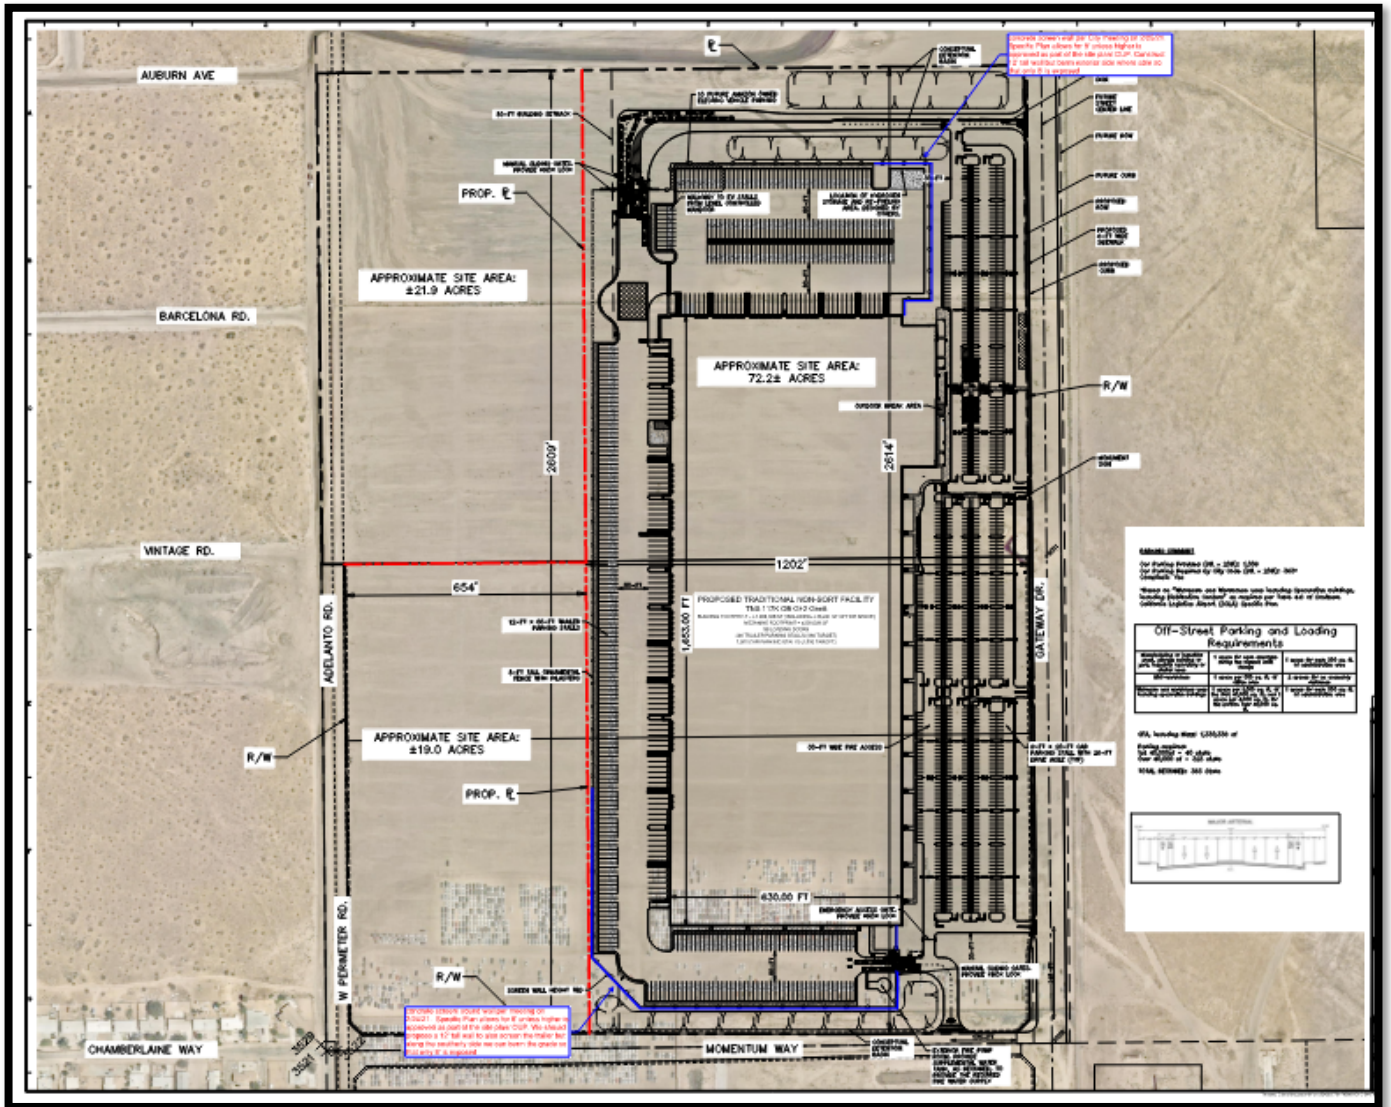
Conceptual Site Plan – SCLA Lot 44 Project
